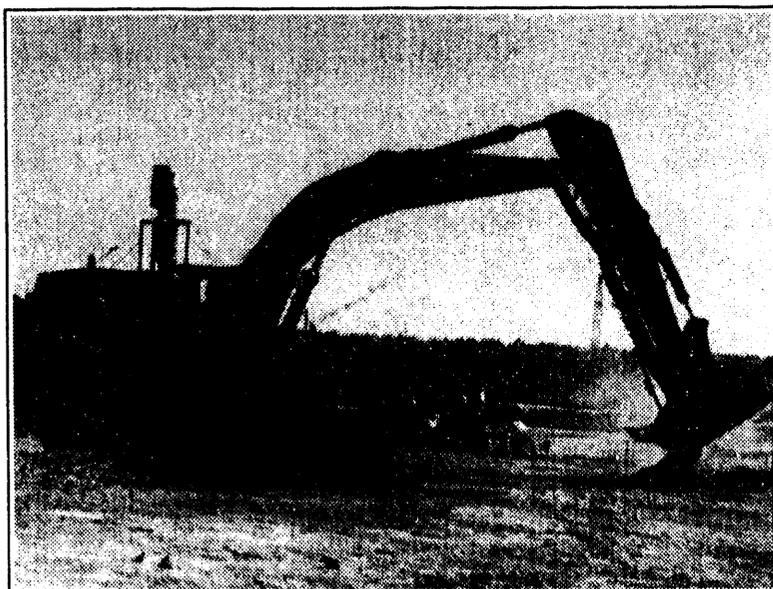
Overburden removal demonstration at the INEL Cold Test Pit.
